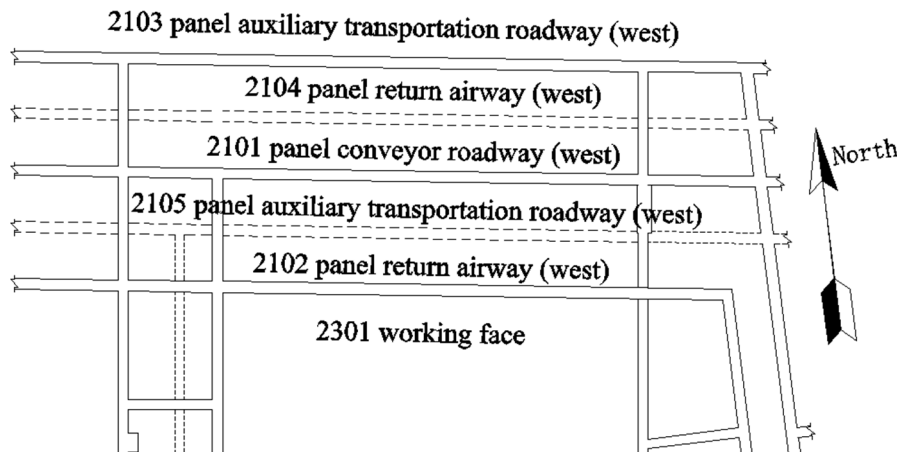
Plan layout of the 2103 Panel Auxiliary Transportation Roadway (West)
